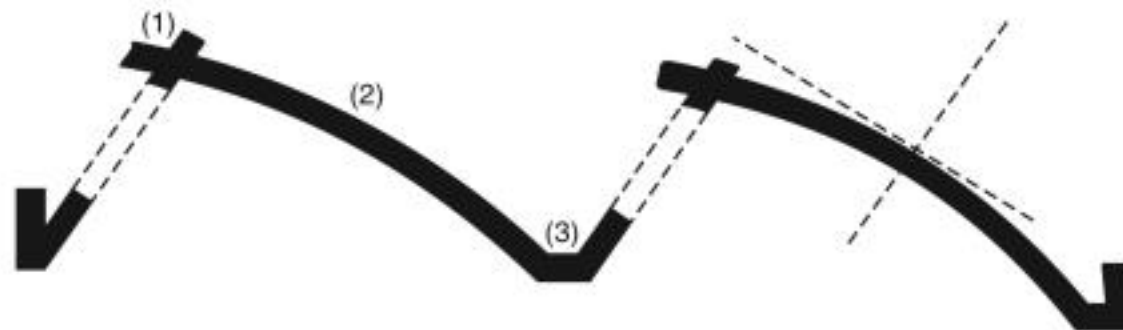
Northlight circular cylindrical shells: (1) Crown beam, (2) Circular shell, and (3) Valley or gutter beam.
